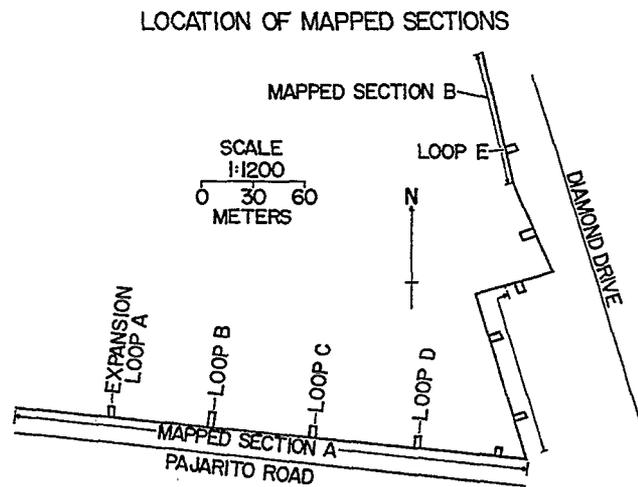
Plan view of the trench showing location of mapped Sections A and B.
